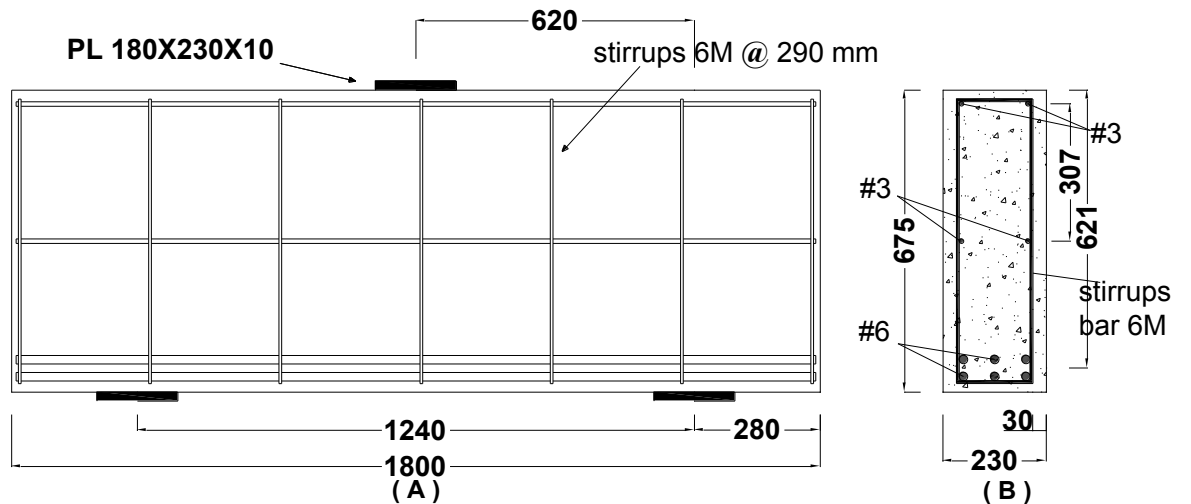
Beam A1/75: (A) elevation (B) cross section
